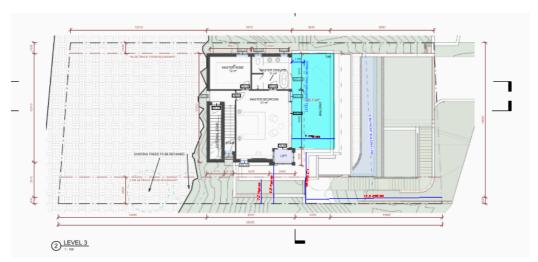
Level 3 Plan with the proposed retaining wall 12.8m from the eastern front boundary and conditioned 1.5m off the southern side boundary
